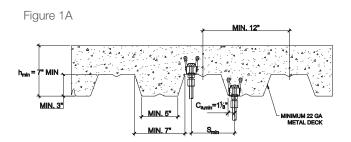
A shows spider in 3 inch profile metal deck with 4 inch of concrete topping thickness.
